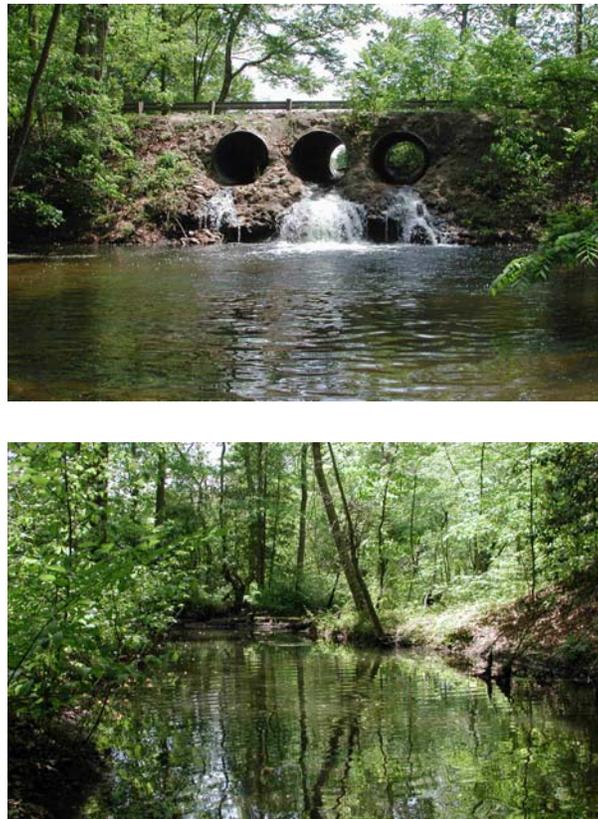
Carter Creek impediment, Rt. 614 Gloucester County, York drainage. Top is looking upstream toward road culverts; bottom is looking downstream from road.
